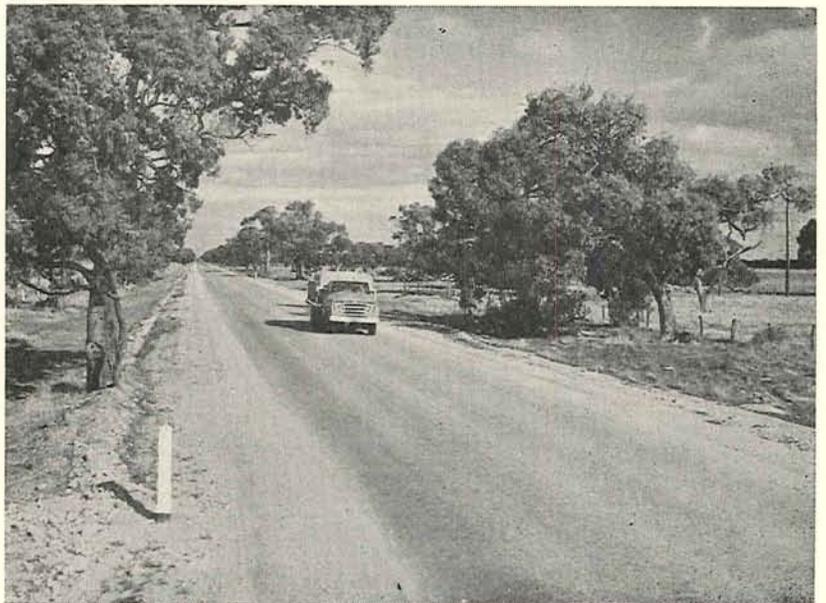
Murray Valley Highway—Reconstructed section at Kerang East.
